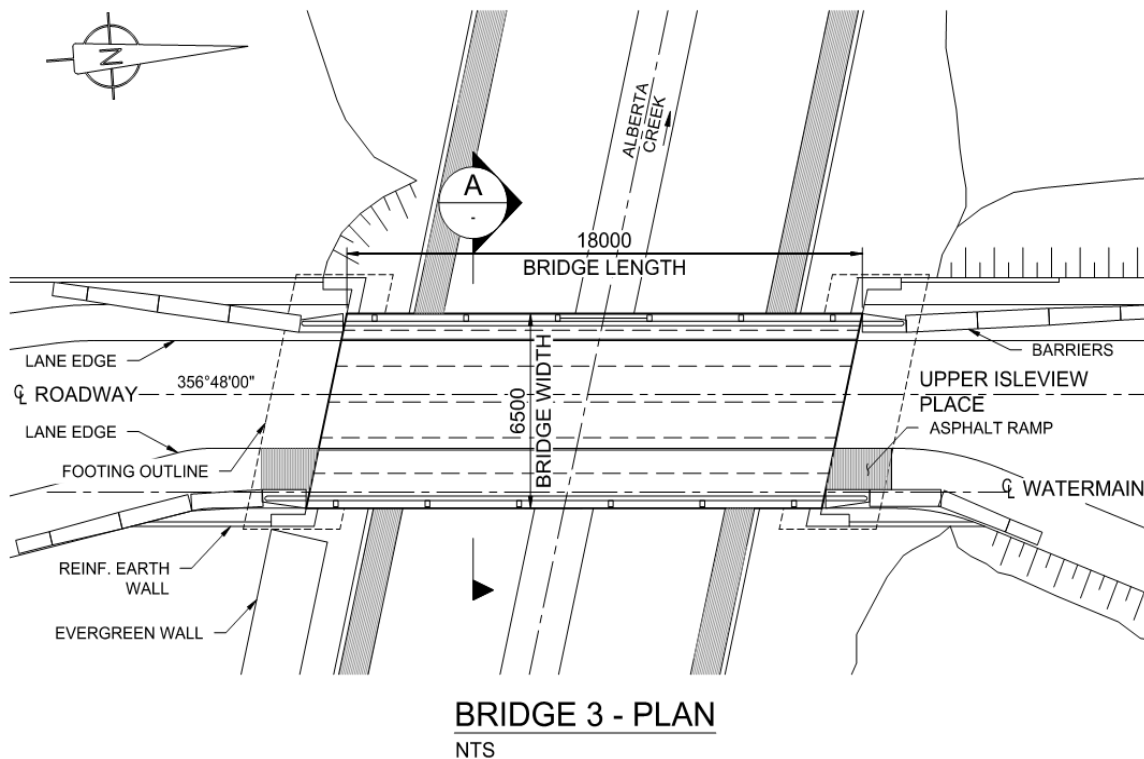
Isleview Place Bridge over Alberta Creek (Upper) – Plan
